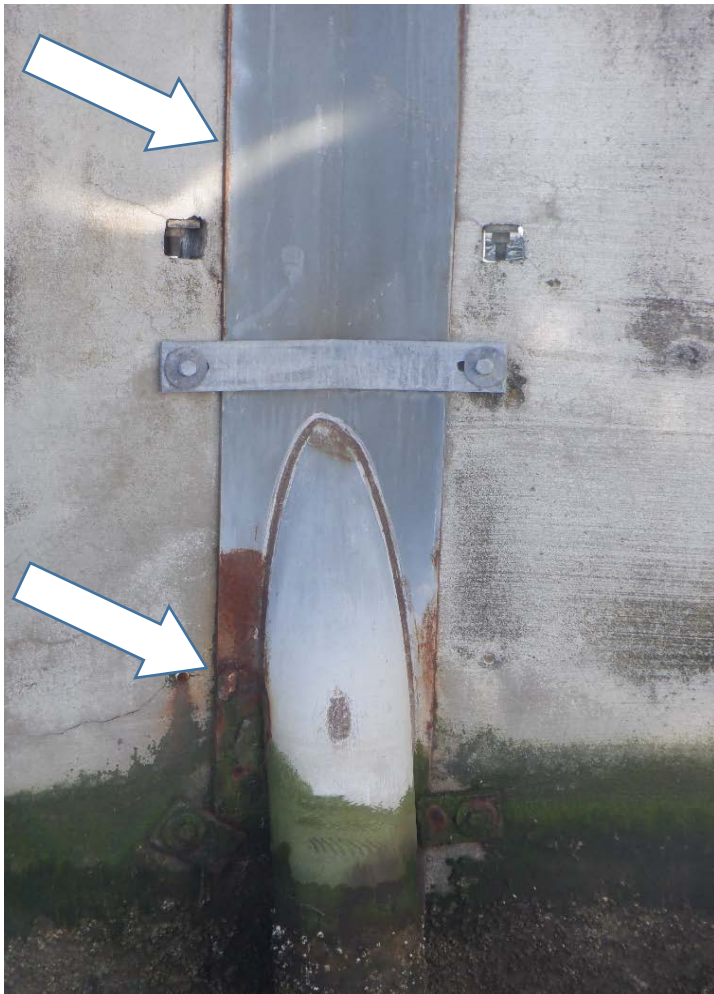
East Breakwater, Interior Face, Pile No. 72 - Note the generally good condition of the galvanized steel above high tide. The galvanized protective coating was found to be primarily intact on the upper portions of the piles. However, deterioration of the coating was evident on the H-Pile flange ends (refer to upper arrow), on the welds, and on the piles in the lower splash and upper intertidal zone (refer to lower arrow).
